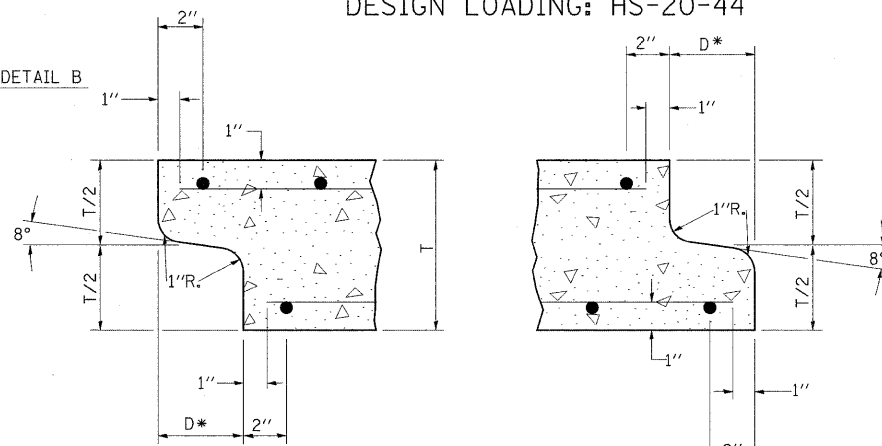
# DETAIL OF PRECAST CONCRETE BOX CULVERT SECTION
